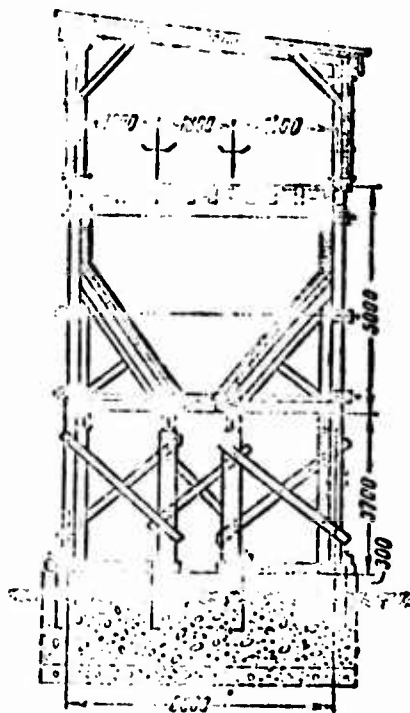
Wooden hopper with central loading into motor vehicles along with their transverse movement.
